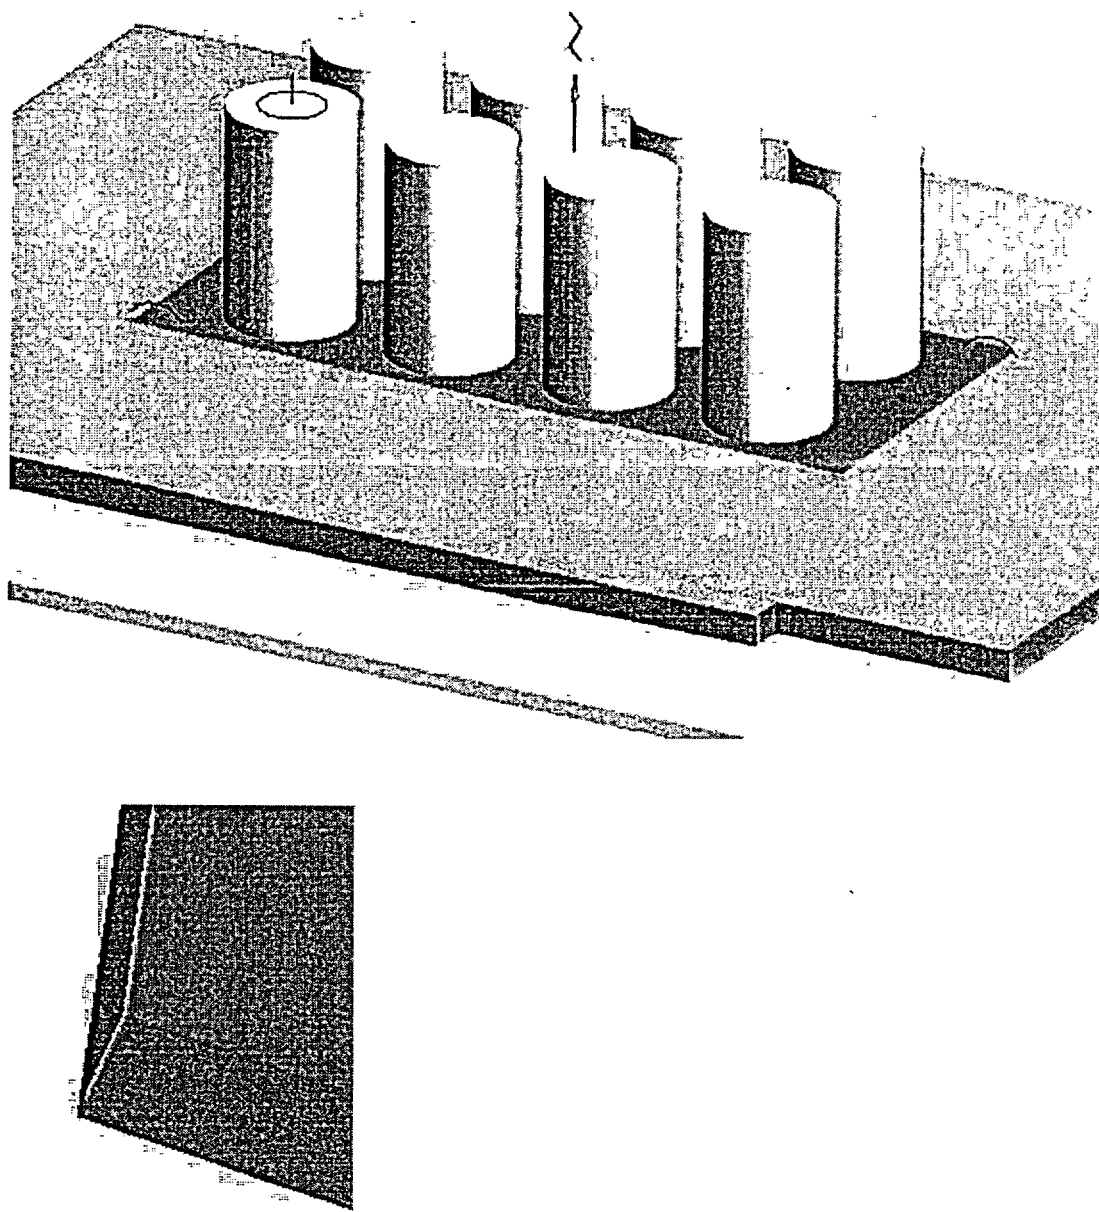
VN Model for Single Pad Surrounded by Soil Cement (with Corner Detail Shown)
